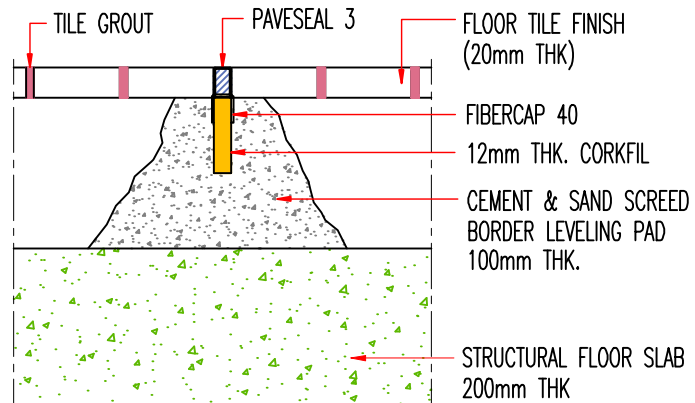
DETAIL EXHIBITING FUNCTIONAL COMPARTMENTALISATION JOINT OF 10mm WIDTH FORMED WITH CORKFIL FROM THE FINISHING LEVEL TO THE STRUCTURAL FLOOR SLAB
